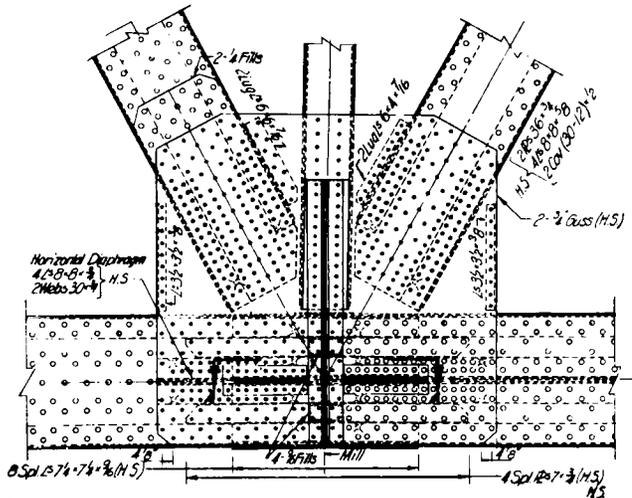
Truss joint of New Orleans Cantilever Bridge, showing stiffening angles along unsupported edges of gusset plate.
